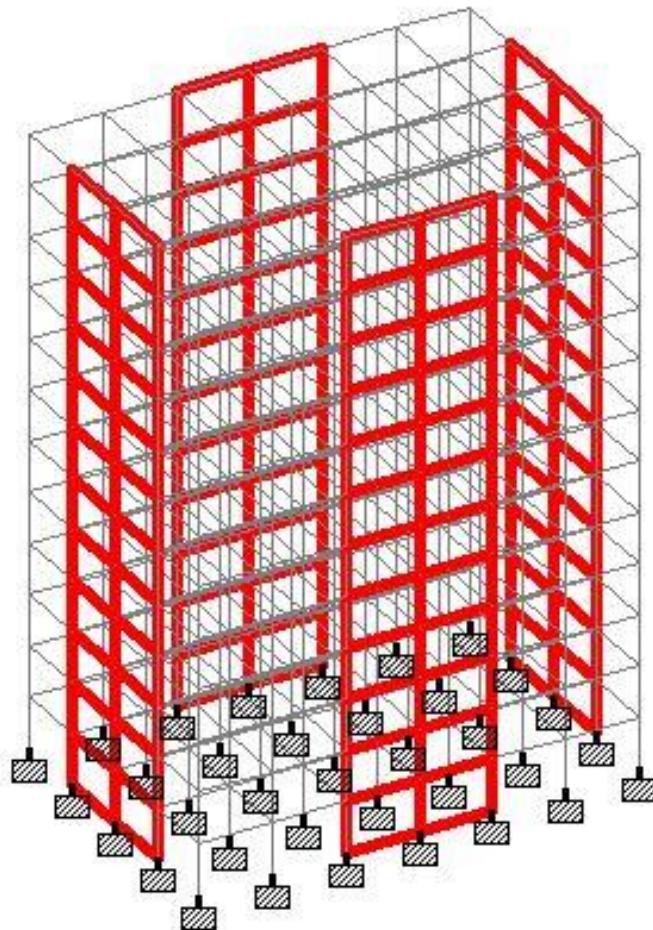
3D view of of Regular Structure with Shear Wall(12 Storeys)
